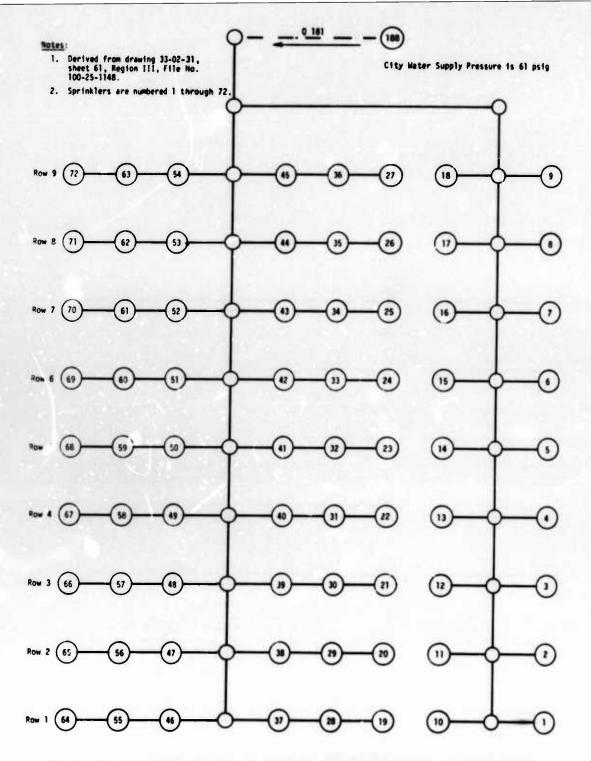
Sprinkler System in Building 786 at McClellan Air Force Base
